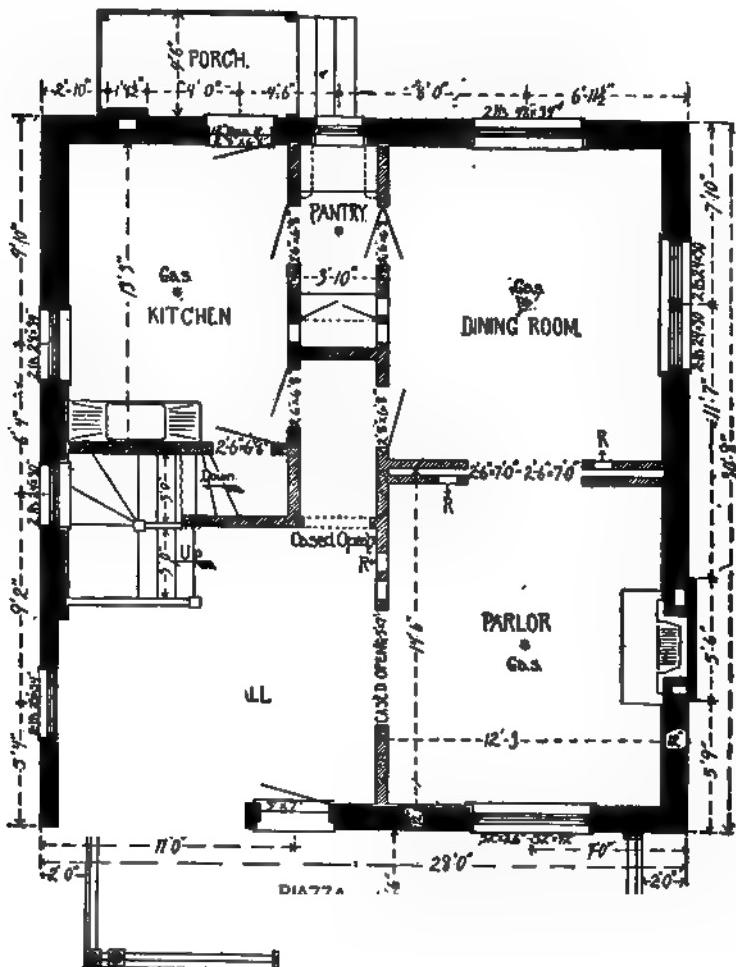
First-Floor Plan. Small Brick Dwelling.
